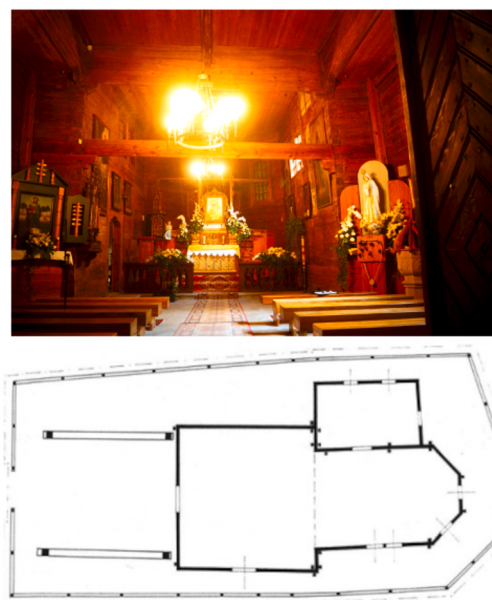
Interior photograph and floor plan of St. Philip and St. James the Apostles Church in Sękowa.
